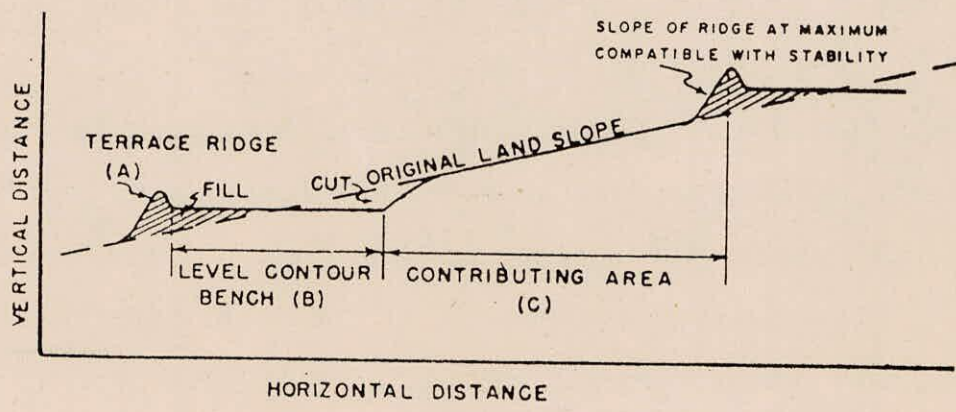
Cross section of a conservation bench terrace (Jones and Hauser, 1975)
